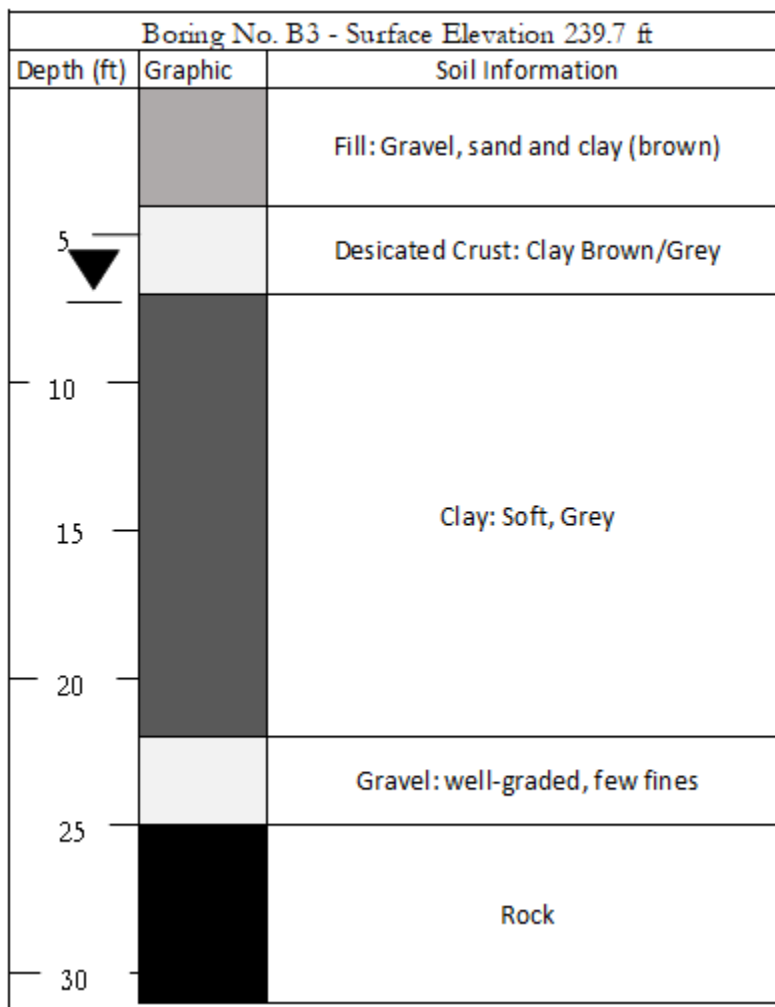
Boring B-3 (note surface elevation and groundwater table elevation (prior to pumping))
